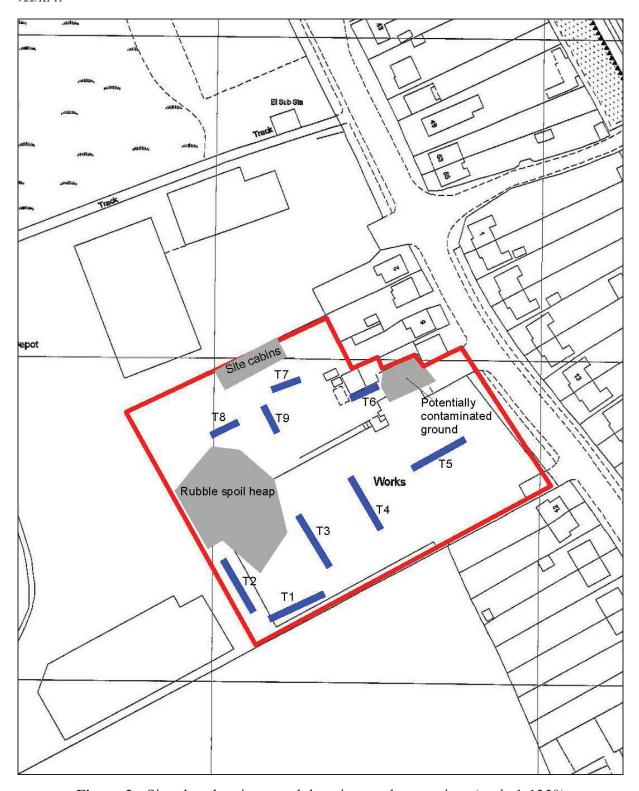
Site plan showing trench locations and constraints (scale 1:1250)
